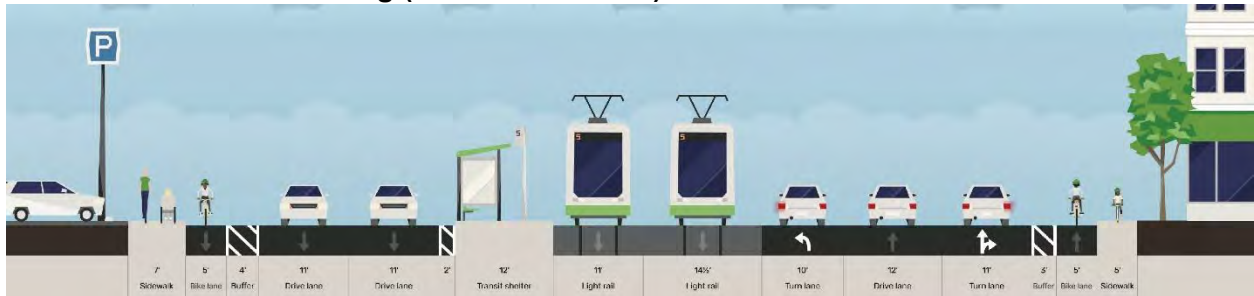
Roadway Cross Sections Near River Oaks Station
